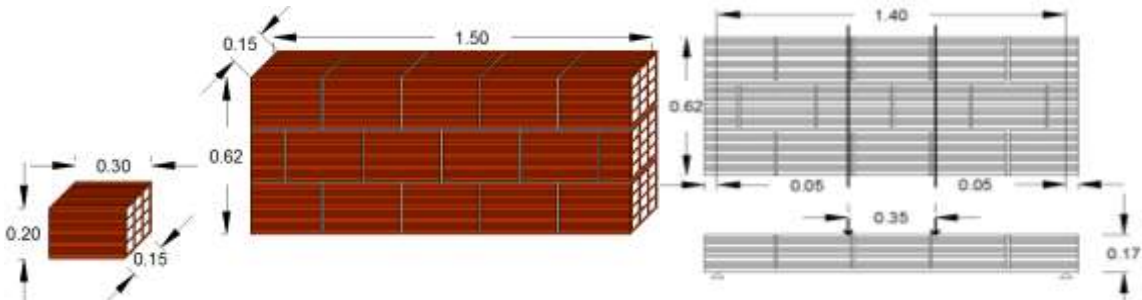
Geometry of the specimens and load configuration (dimensions in meters)
